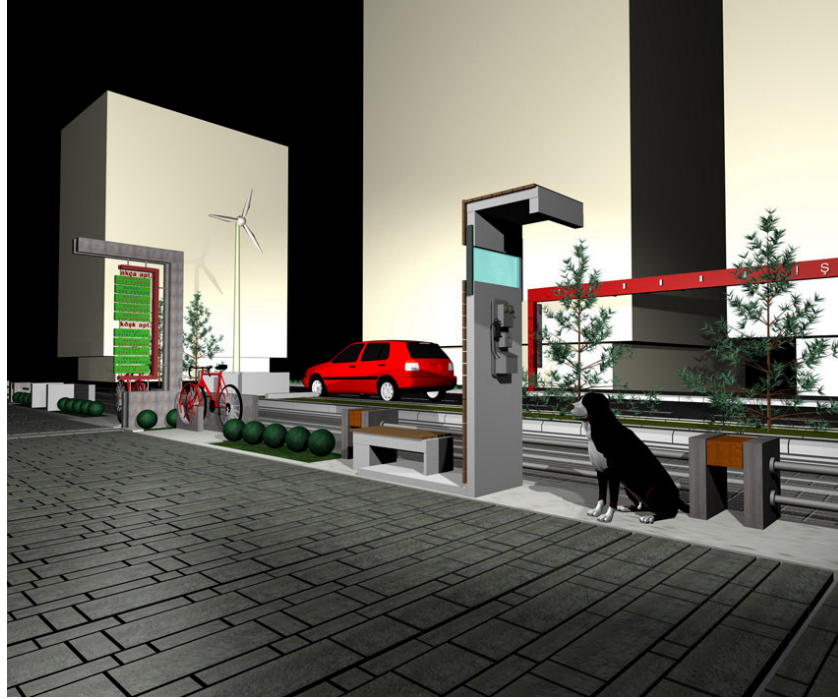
Improve sidewalks with pavement and variable street amenities.
